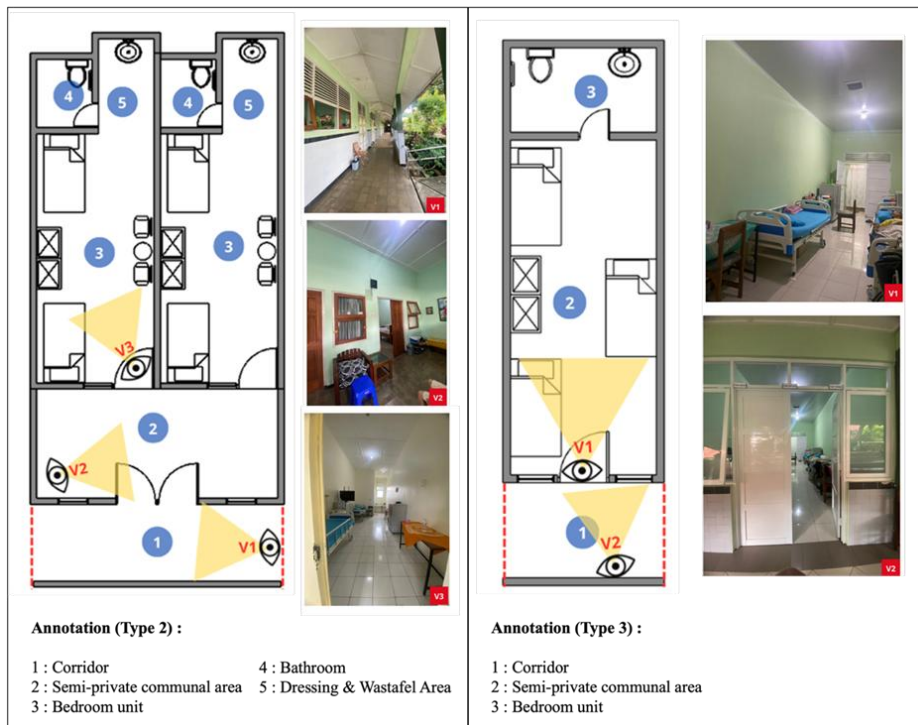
Layout-Plan and Existing Condition of Type 2 (Left) and Type 3 (Right)
